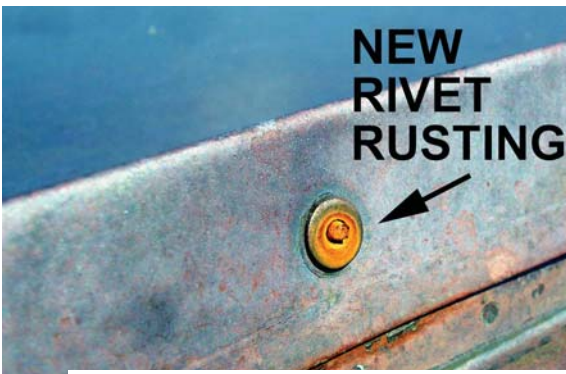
Copper rivets with steel mandrels will rust almost immediately, even through a solder joint.
